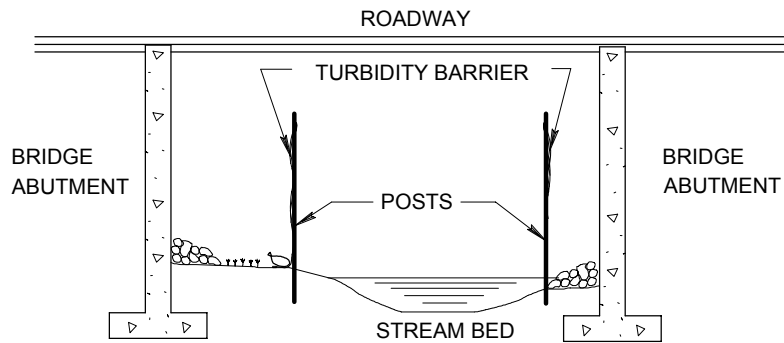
TURBIDITY BARRIER DETAIL SHOWING TYPICAL PLACEMENT AT STRUCTURES
